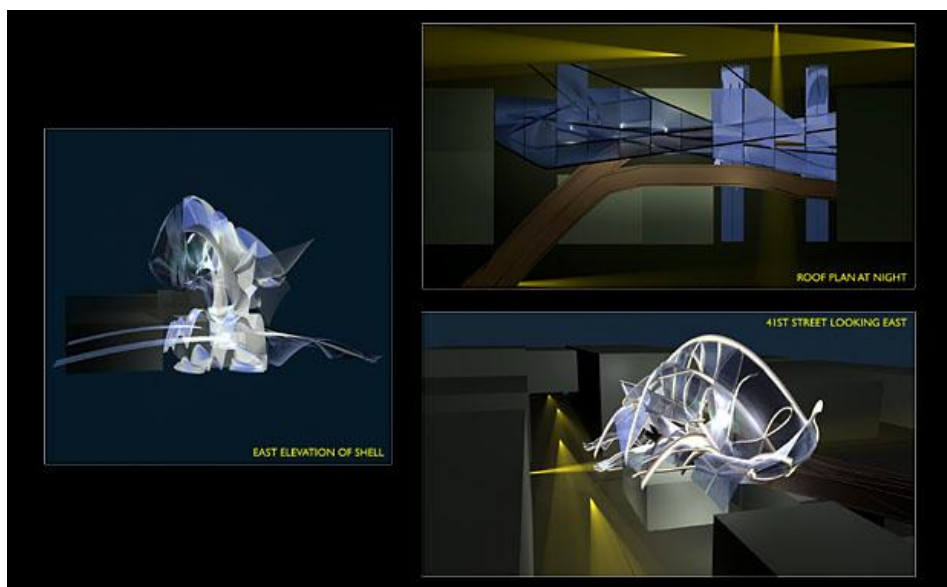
Top right: roof plan, bottom right: street view, left: East elevation, Greg Lynn 1995.
